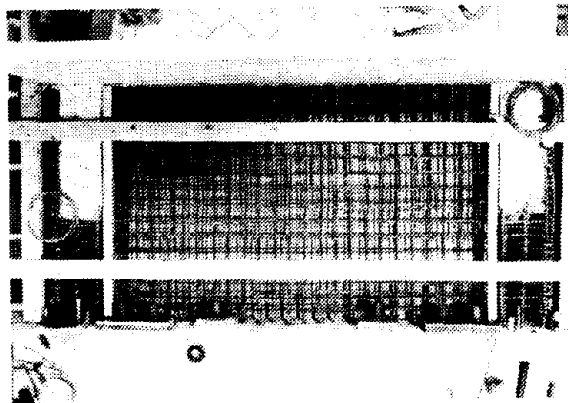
Framed Wall After Removal of Damaged Concrete and Placement of New Steel Reinforcement
